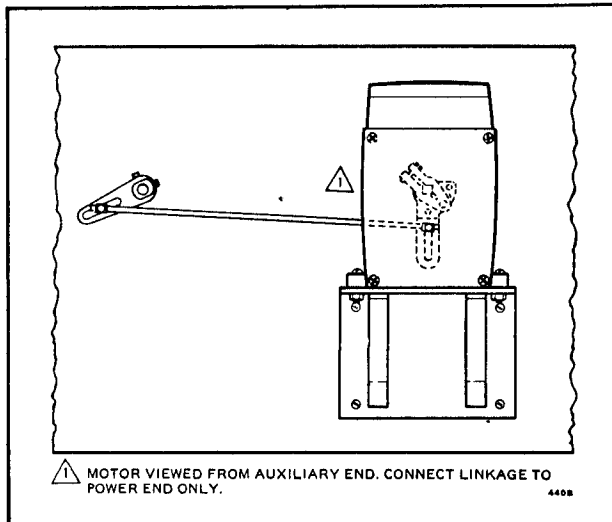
MODUTROL MOTOR MOUNTED EXTERNALLY ON THE DUCT TO CONTROL ONE DAMPER.
